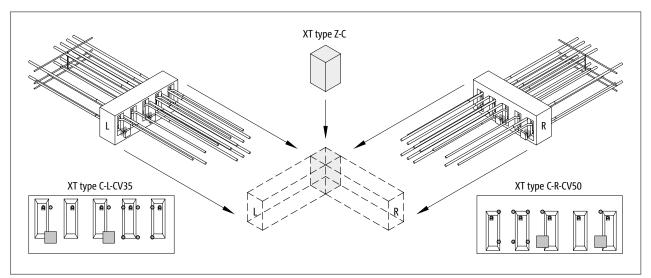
Schöck Isokorb® XT type C-L-CV35, XT type C-R-CV50: Arrangement at the corner using corner insulating element
